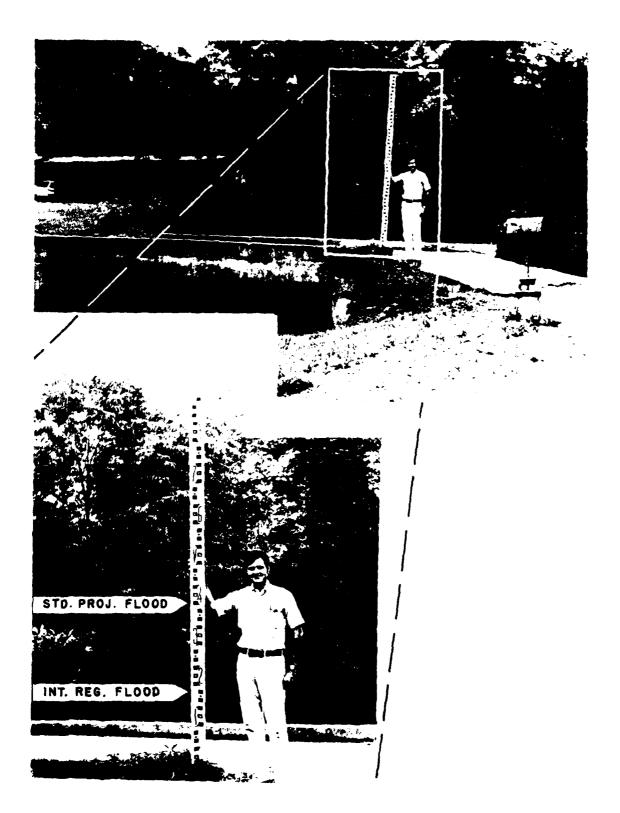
Future flood heights at a private bridge off Douglasville Road.
